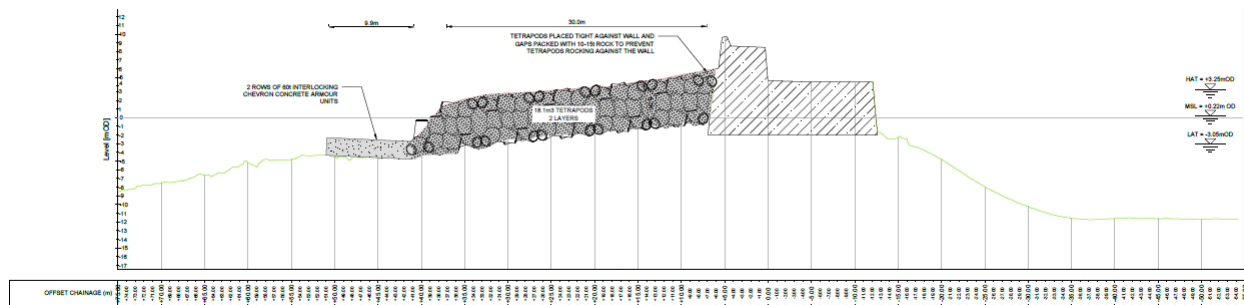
Typical cross section through proposed Tetrapod solution for the seaward side.
